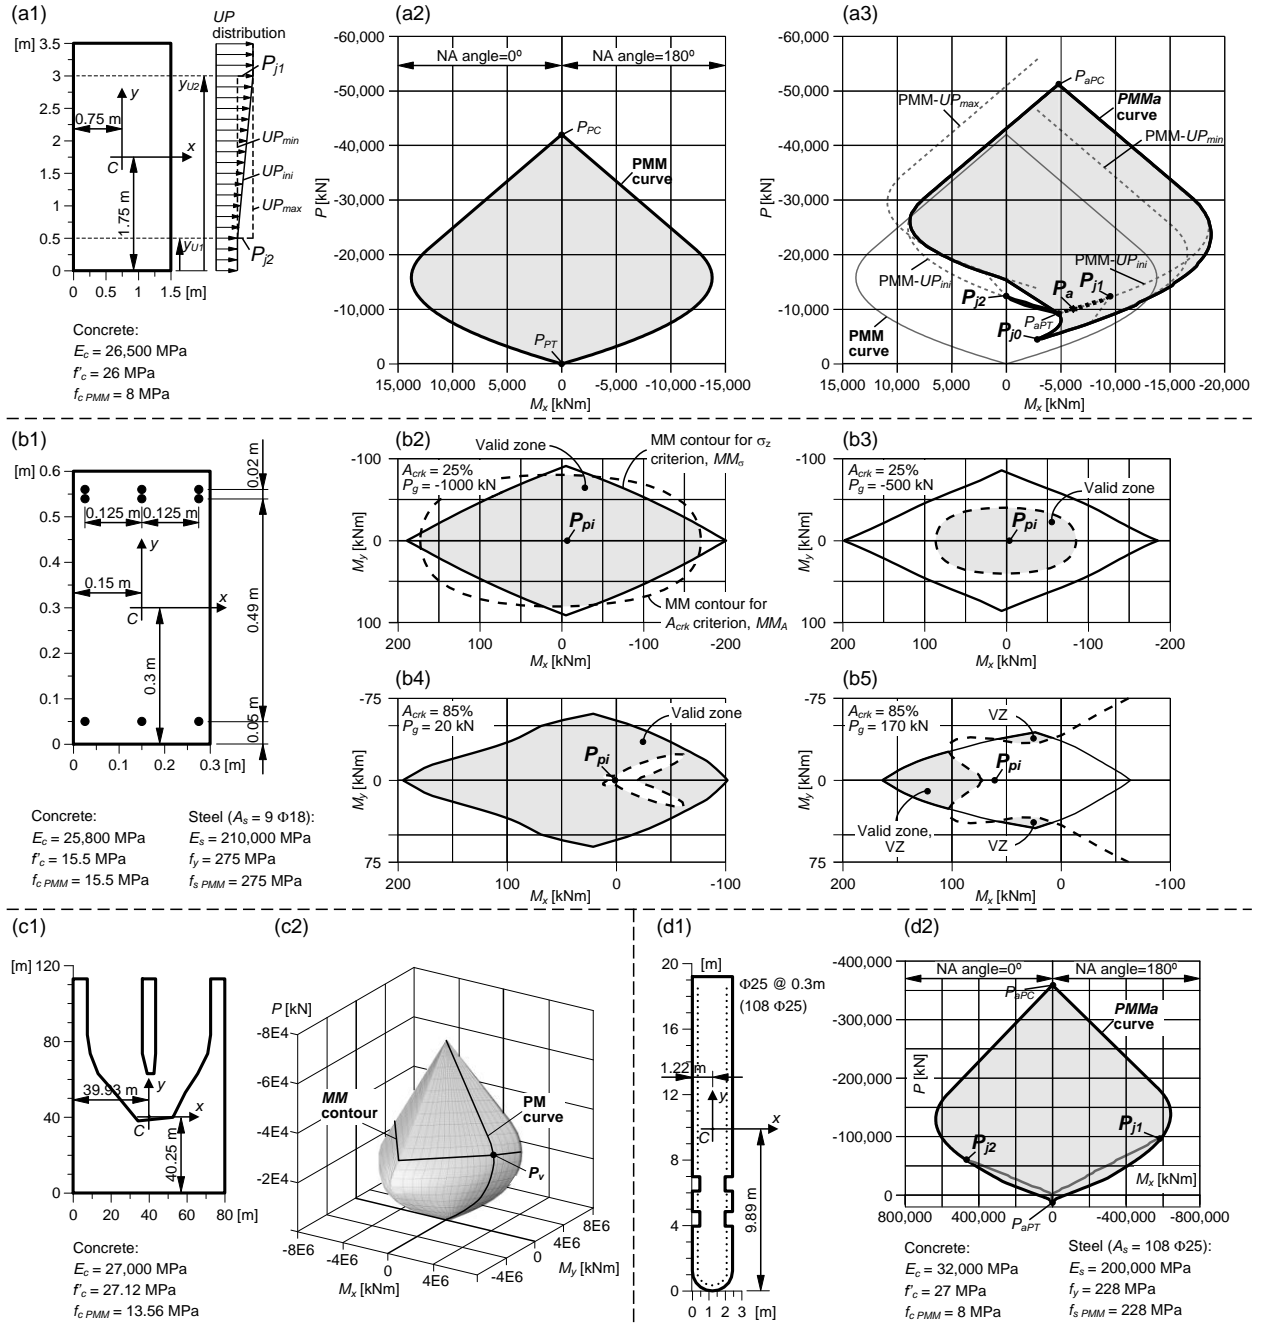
Validation examples: (a) PMM and PMMa envelope for plain concrete section (UP effect); (b) MM load contours for reinforced concrete section with the cracked area criterion; (c) three-dimensional envelope for powerhouse section; and (d) PMMa envelope for reinforced spillway pier (UP effect)
